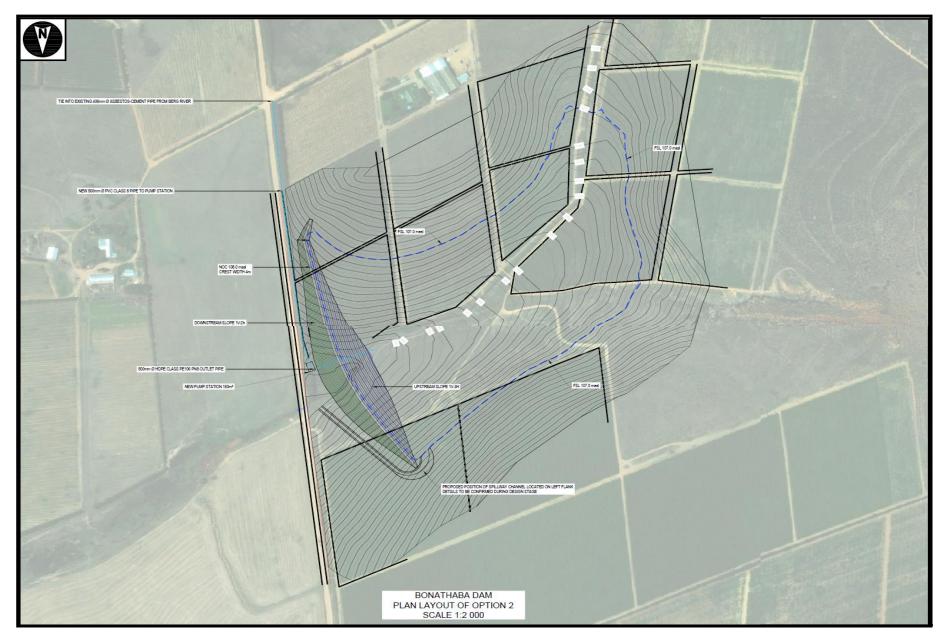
Proposed, preferred site plan layout. Source: Ingerop Consulting Engineers and Project Managers, (2020). Note, map direction (i.e. north direction). See Appendix 2 for more information.
